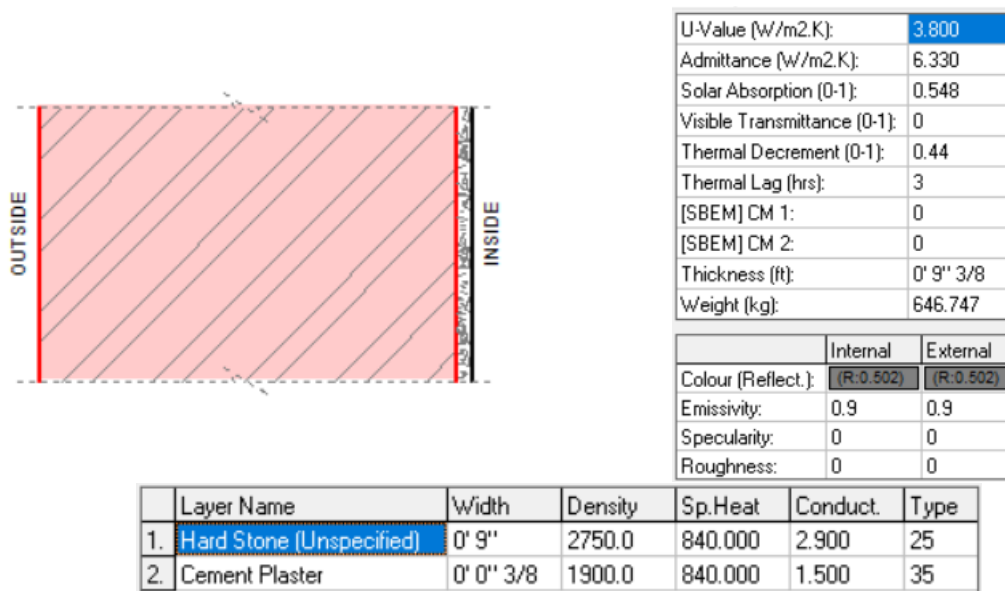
Wall section, material property and the layer of material used in post disaster reconstructed building
